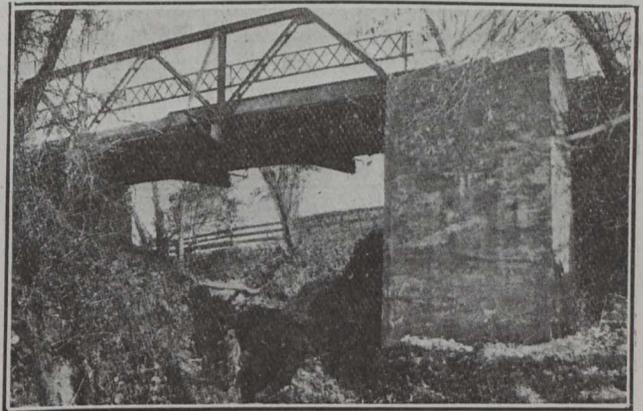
This 40-ft. Steel Span on 20-ft. Abutments has a Drainage Area of Only 69 Acres. Cost \$5,187.
